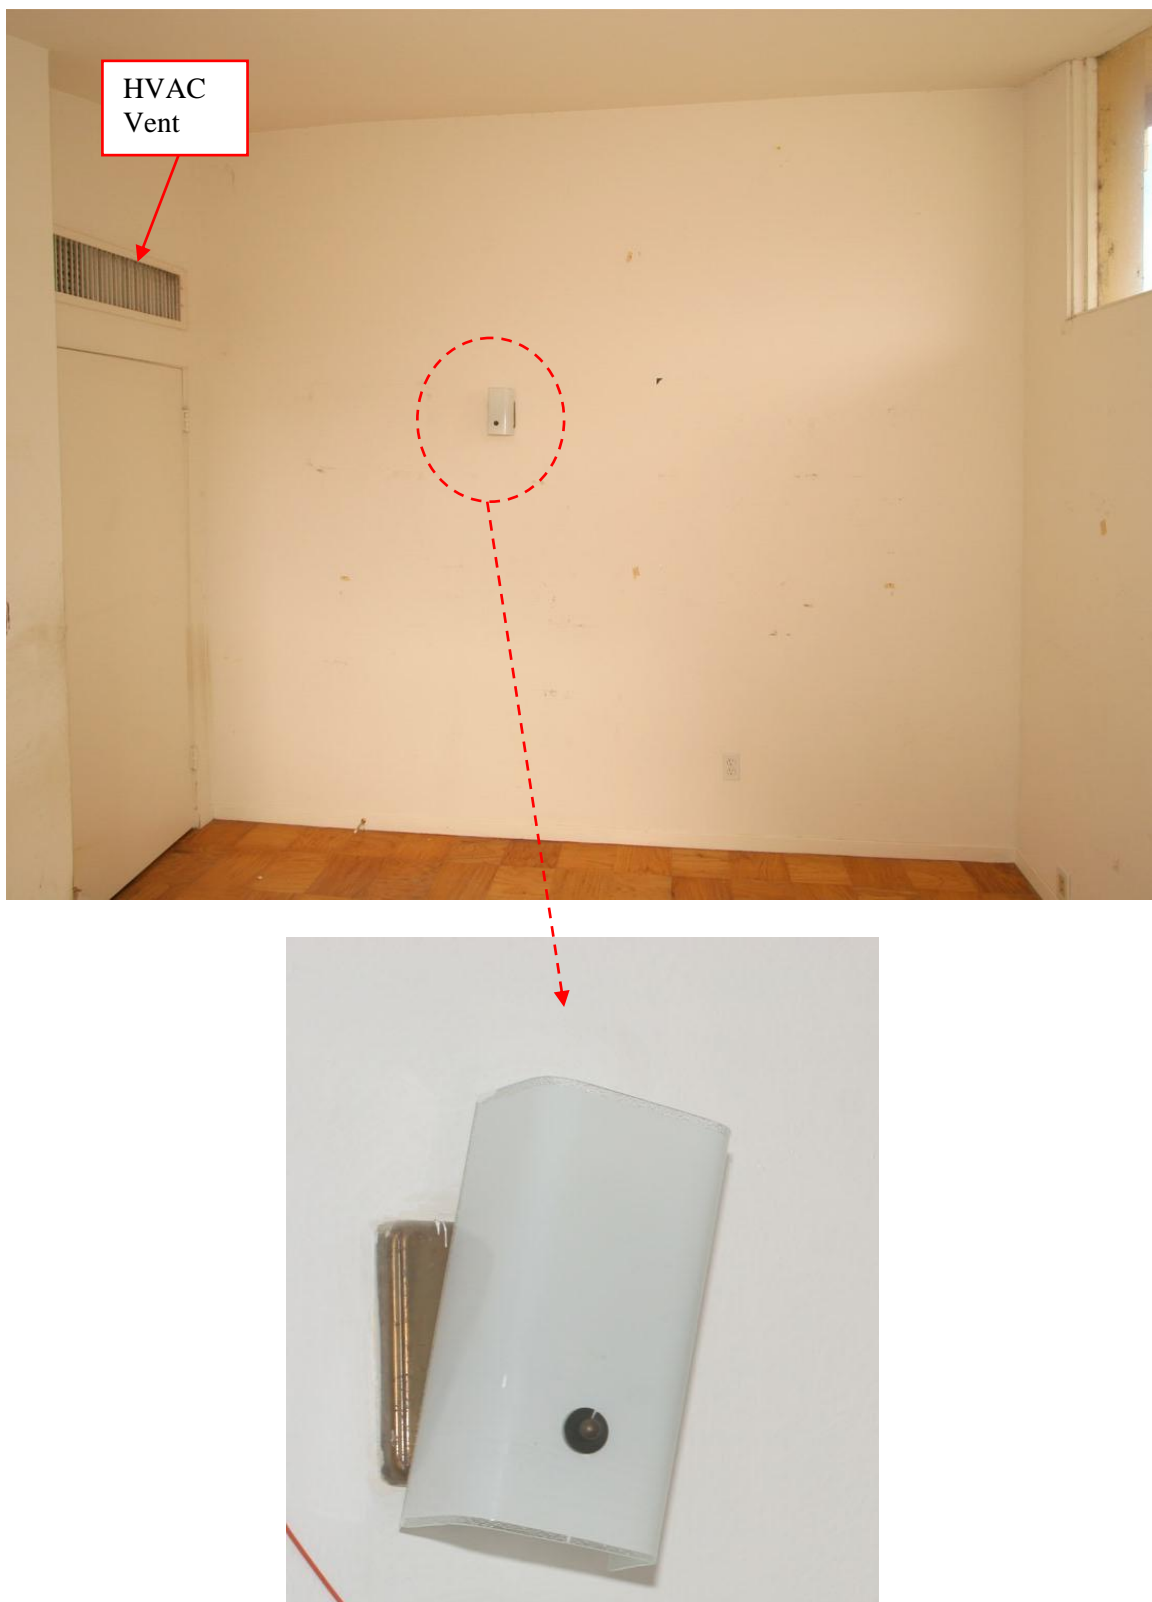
Picture of the lighting fixture on the west wall of the back bedroom.
